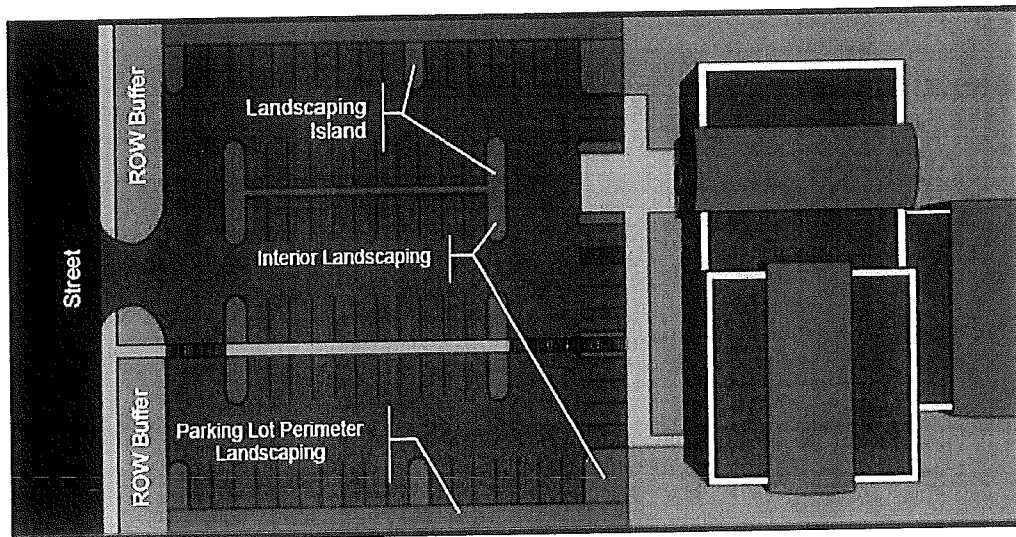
Island, Interior, and Perimeter Landscaping Plan View Illustration
